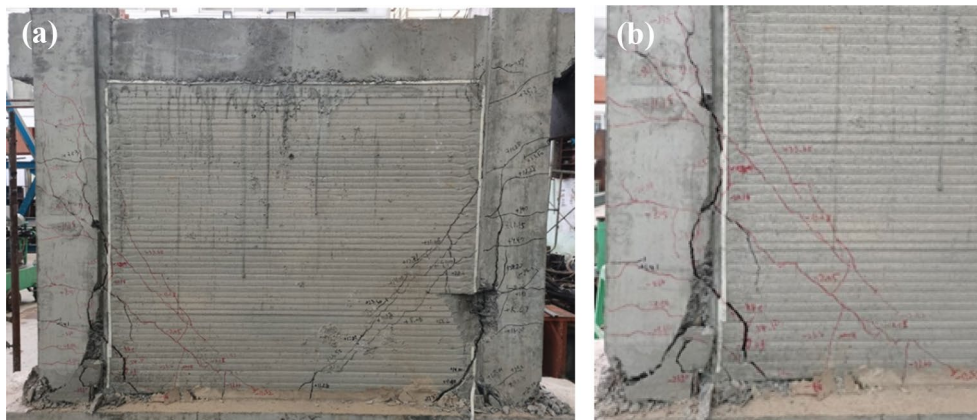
Detailed drawing of the final damage pattern of Specimen 2. a Overall crack development at the back of the specimen. b Damage phenomenon at the bottom of the column
